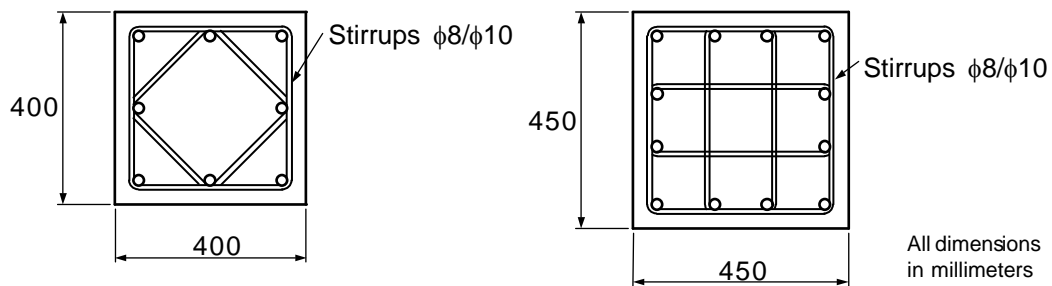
Typical Cross Section of Exterior and Interior Columns (Adapted from 4-14)
